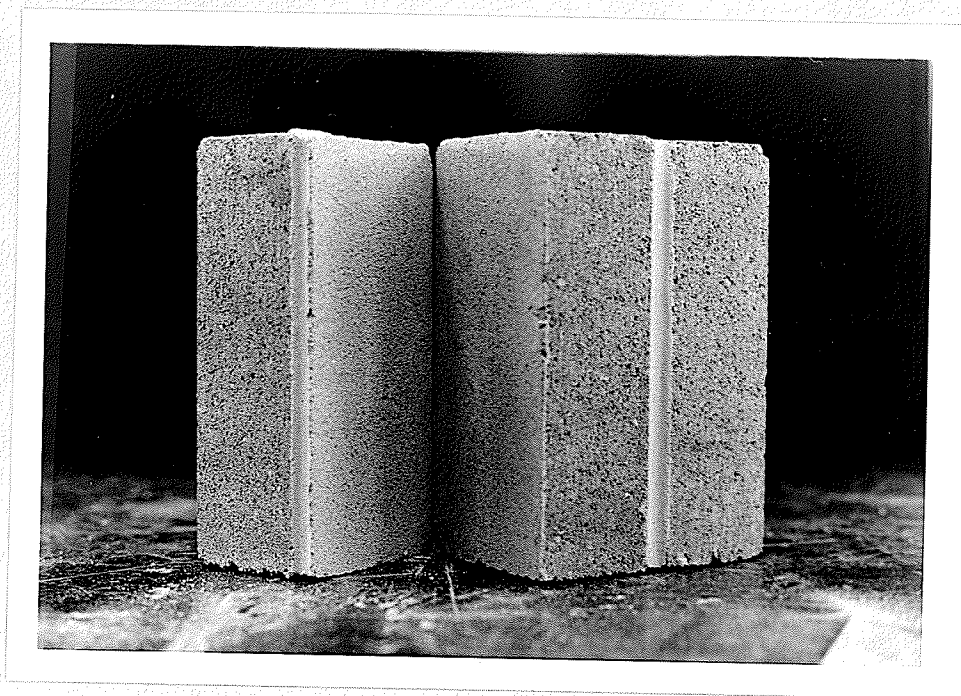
TYPICAL BOND FAILURE IN SHEAR TEST
